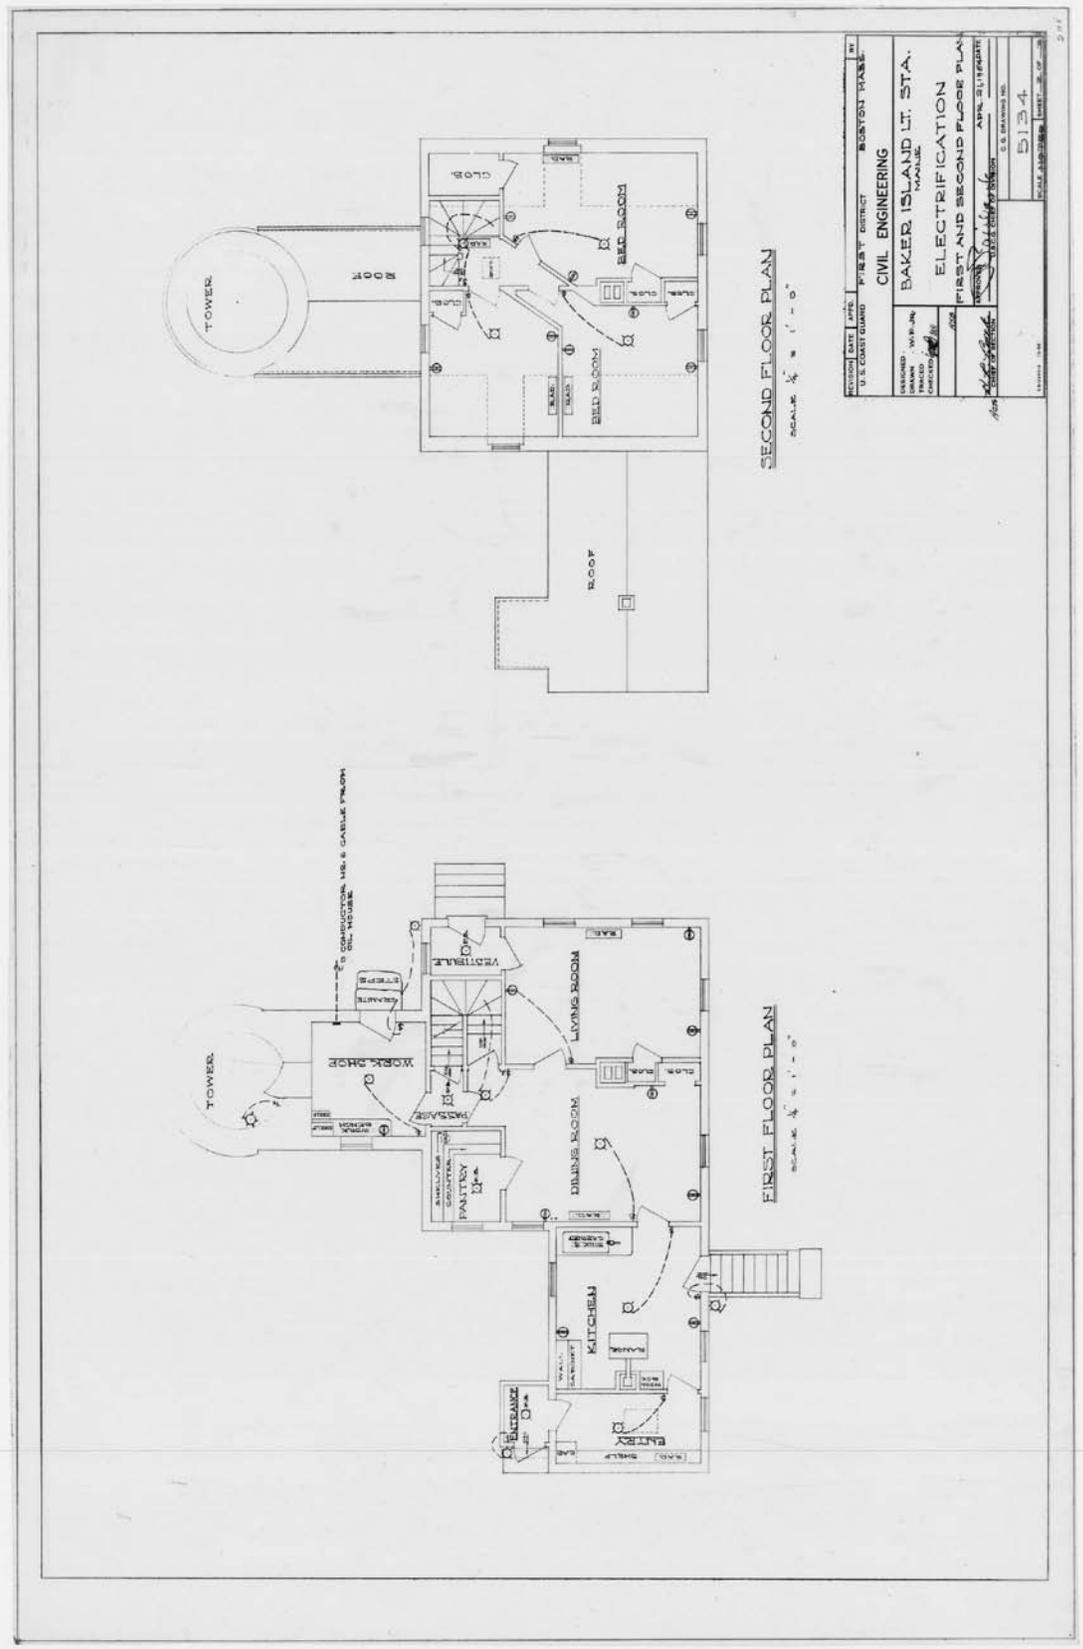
Sheet 2: "Baker Island Lt. Sta., Maine, Electrification: First and Second Floor Plan," April 21, 1954.
